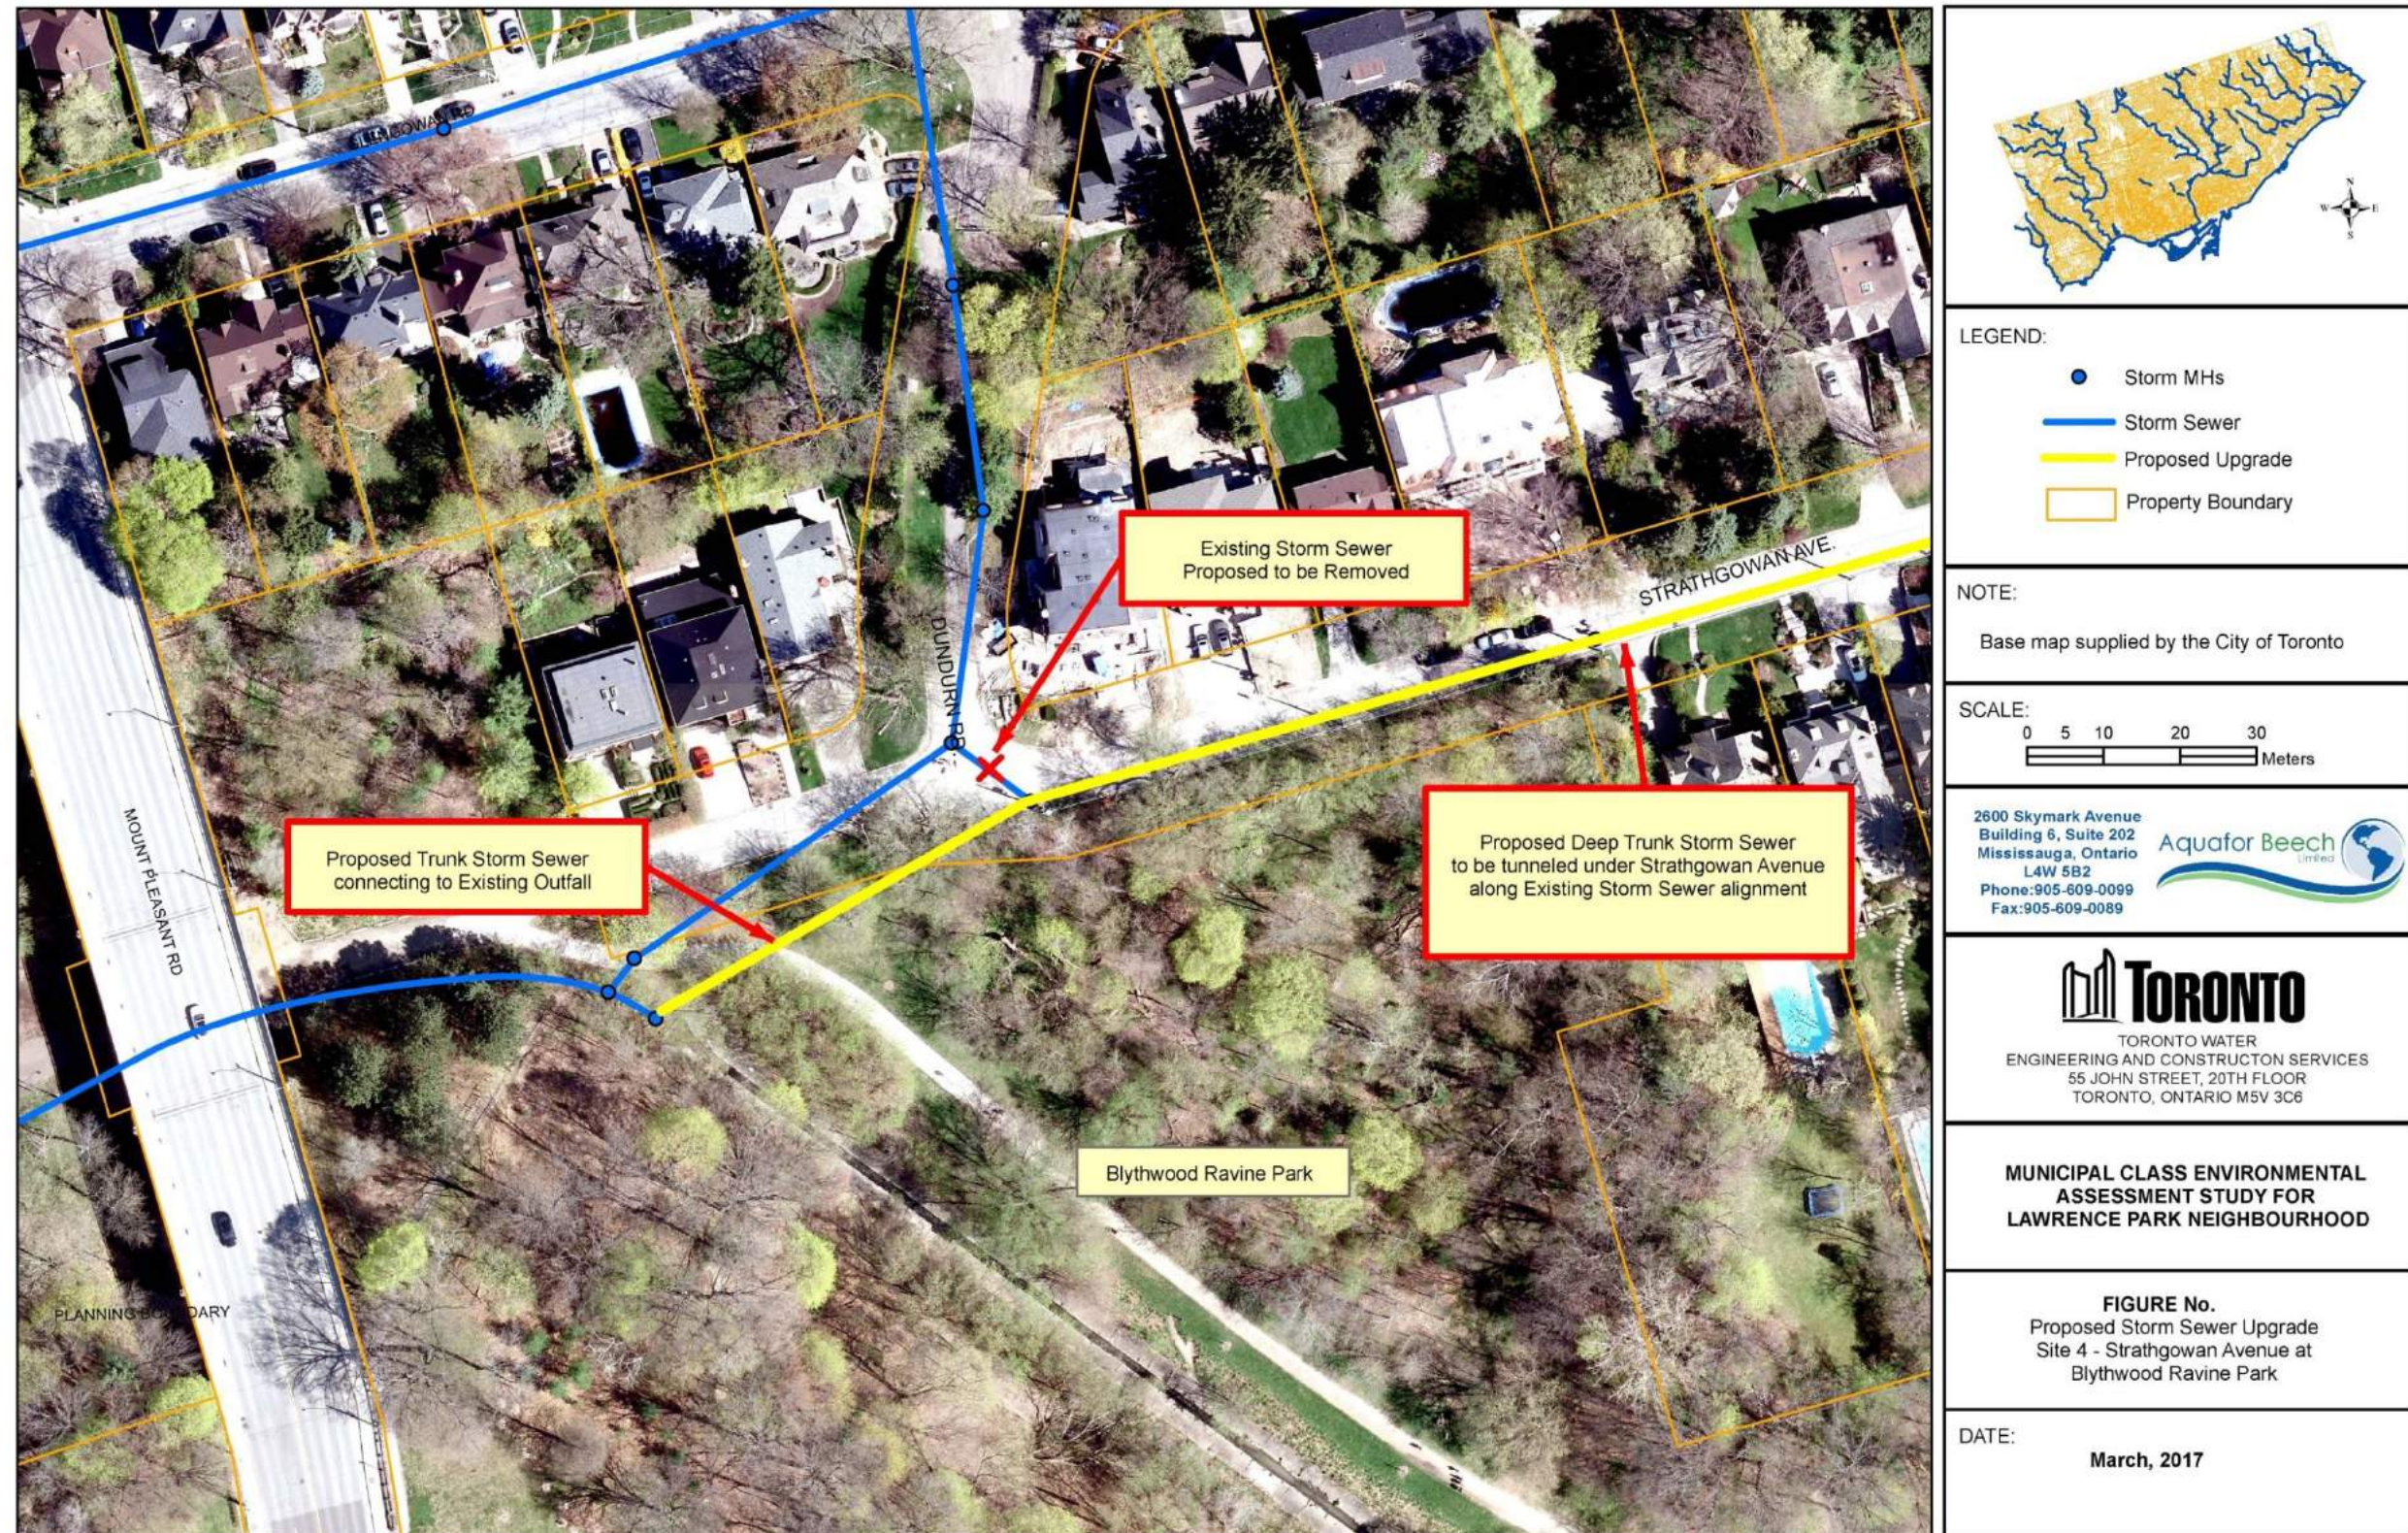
Proposed Storm Sewer Upgrades at Site 4
